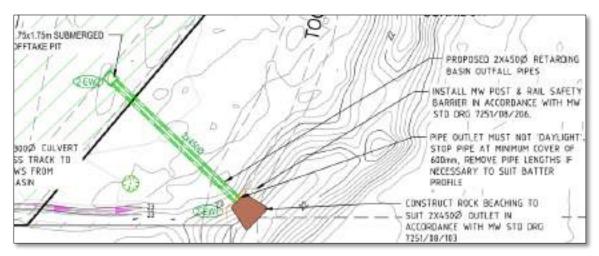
Toomuc Creek Outlet, Detail Plan, Dwg 22084.2DP01 Rev A
